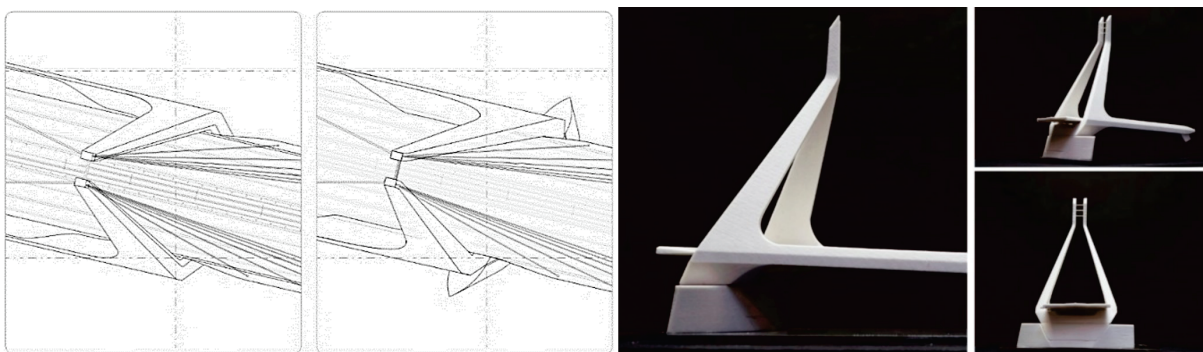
Changes to the river pier pylon (plan and 3D printed geometry) – © UNStudio
